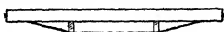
BEAM REINFORCED WITH TRUSS ROD.
